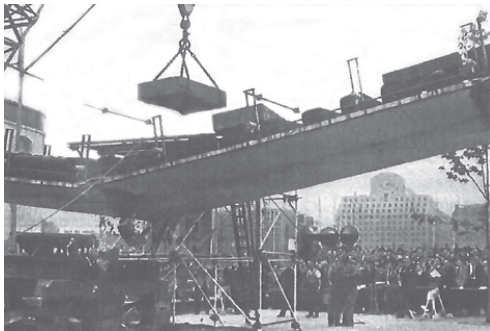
The South Bank Bridge after collapse (N/A 1952).
